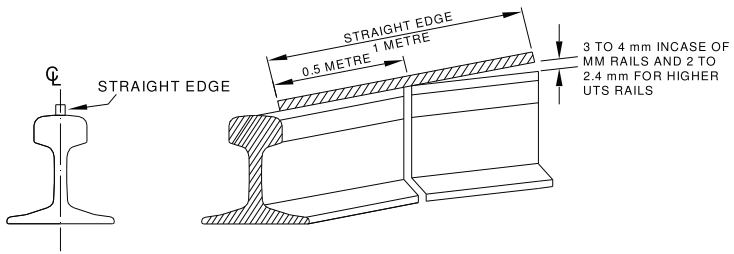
(c) Tolerance for Vertical Alignment at the Time of Welding
